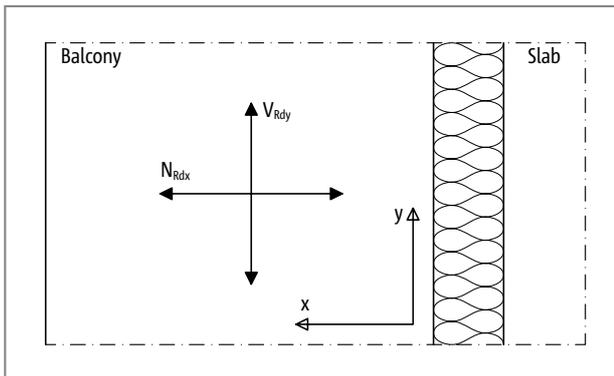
Schöck Isokorb® XT type H: Sign rule for the design
